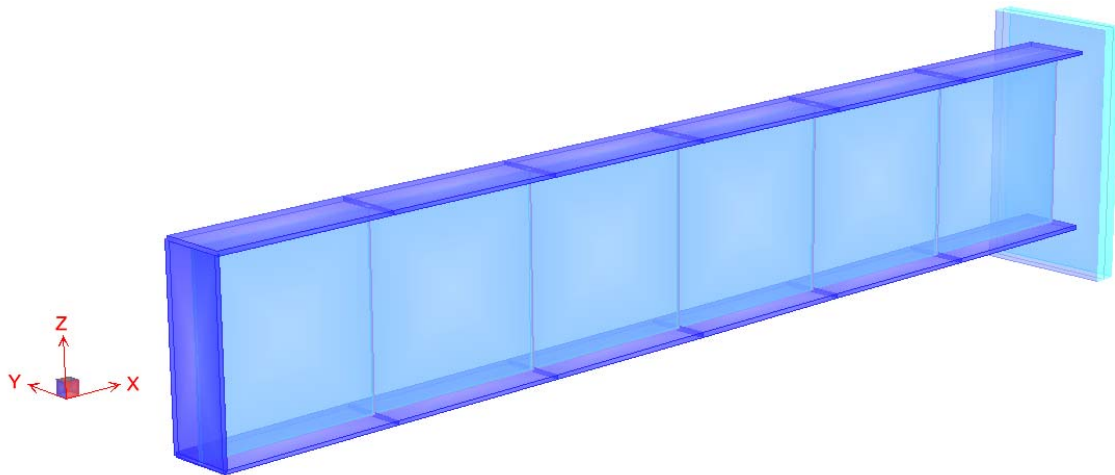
Loading cases for cantilever beam benchmark test.
